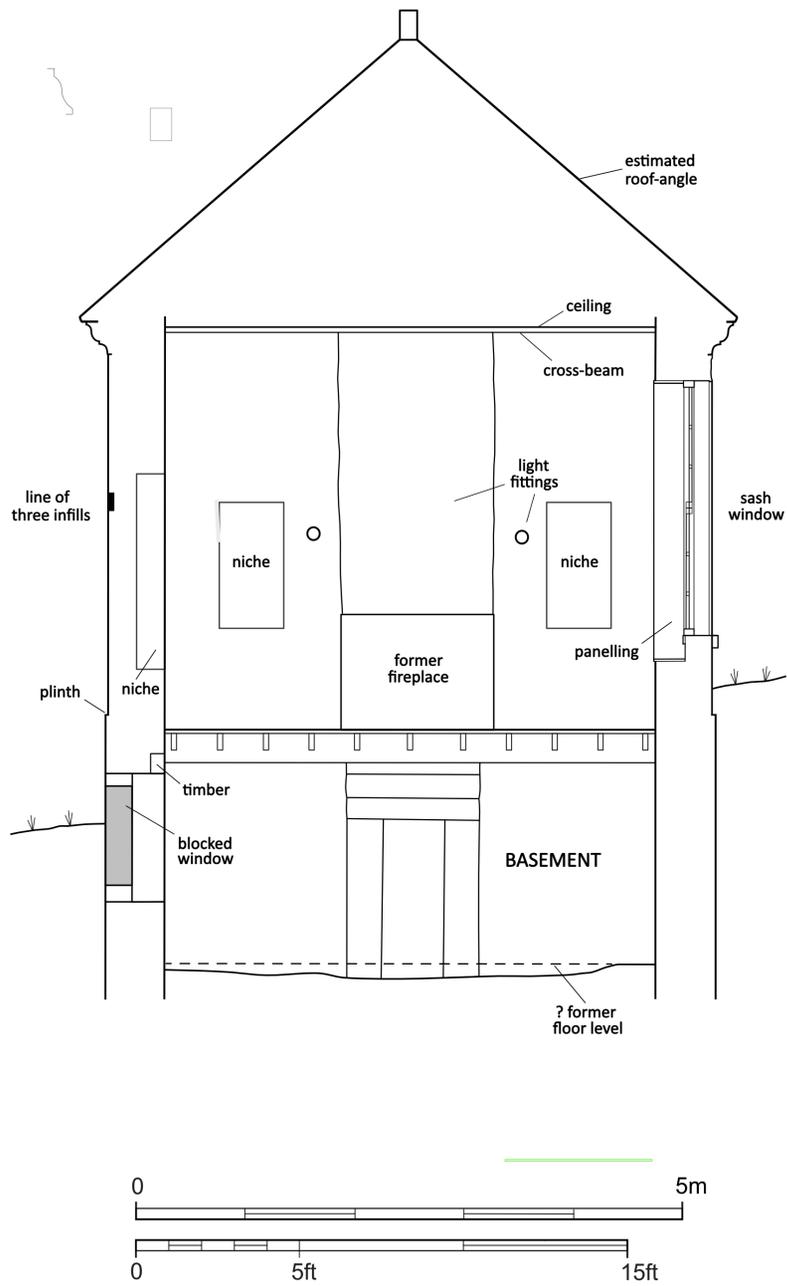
Bridge Cottage, Cromford: East-west cross-section and of view of internal south face. Scale 1:50.
